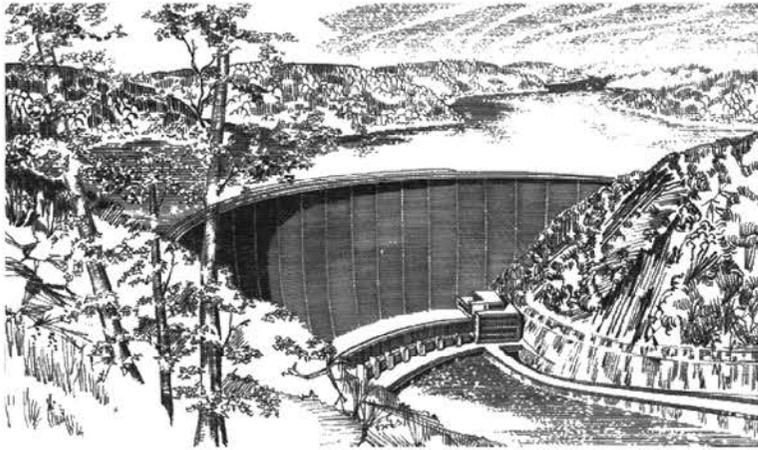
Scenario for the construction of an arch dam at Dalešice (after Konečný in Hanák and Mezlík, 1972)
